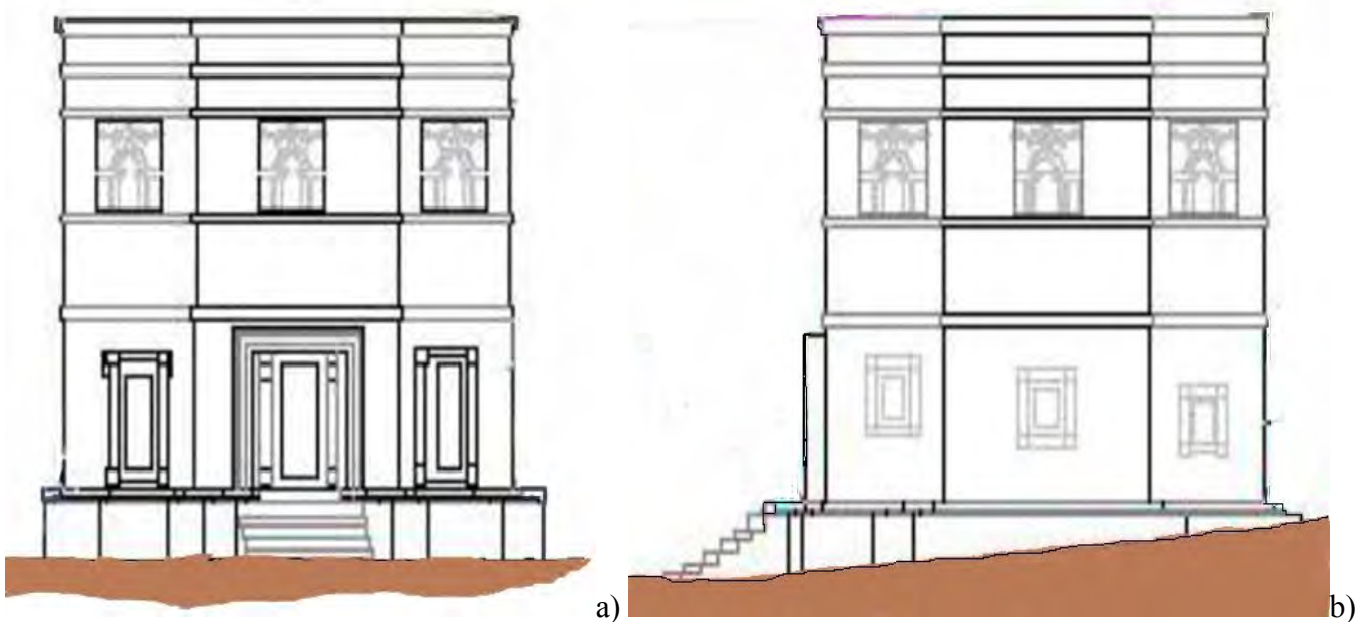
a) The Front (East-West) Elevation Plan of Bete Ghiorgis b) The Side (North-South) Elevation Plan of Bete Ghiorgis
